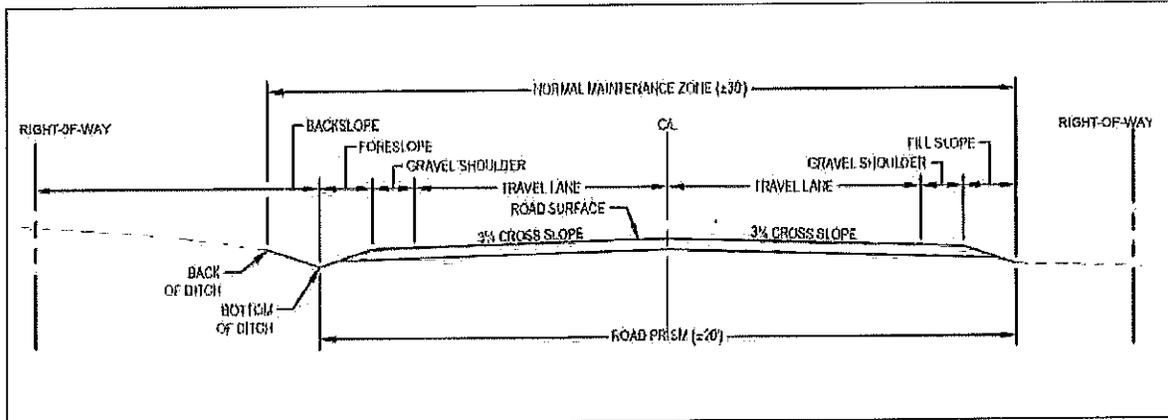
Typical Road Section for Gravel and Paved Surfaces
